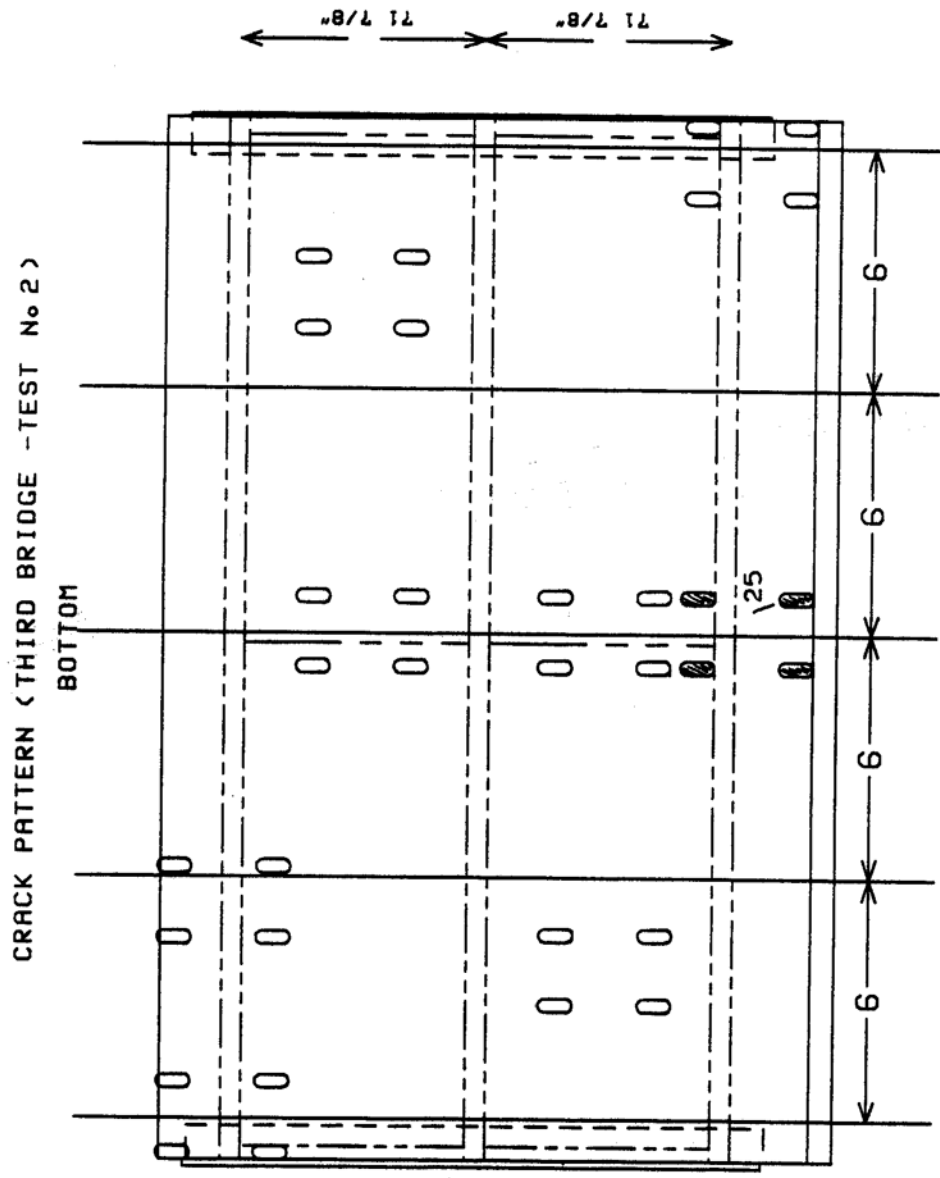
Bottom Cracking Pattern (Third Bridge - Test No. 2)
